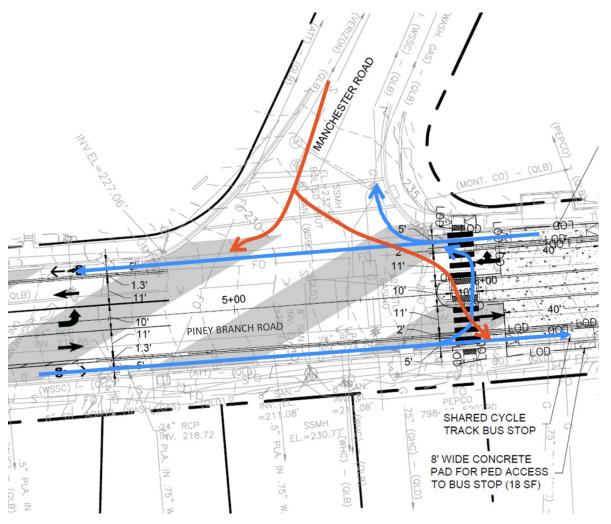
Piney Branch Road at Manchester Road Bicyclist Movements
